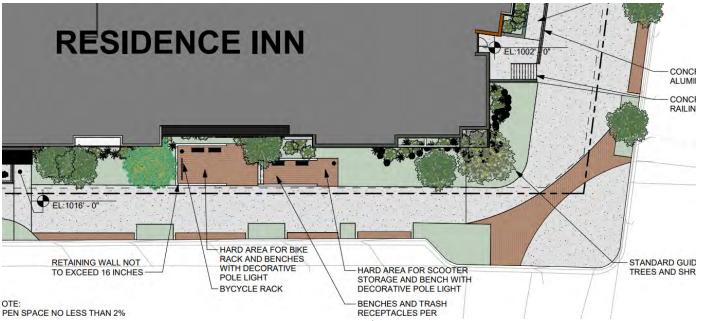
Location of pedestrian plaza at southeast corner of 87th Street and Penrose Lane.
